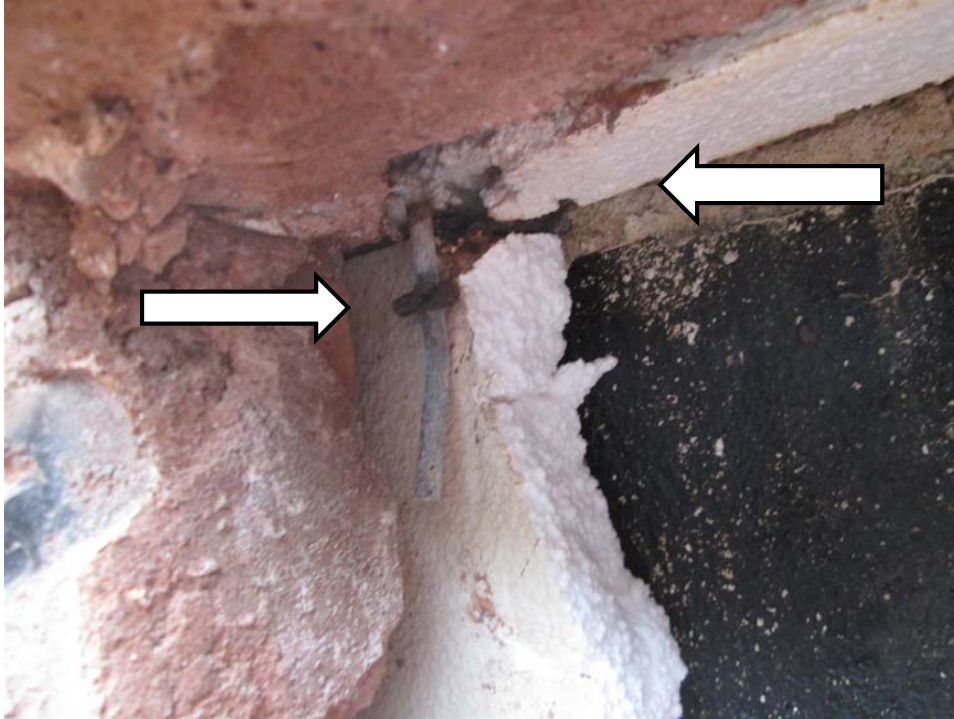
Photo N – South elevation; location two; the pintle extended into the eyehook, but the eyehook was rusted, and no longer engaged to the backup wall. The arrow on the right indicates the location where the shank of the eyehook is, versus the arrow on the left, which is where the “eye” is.
